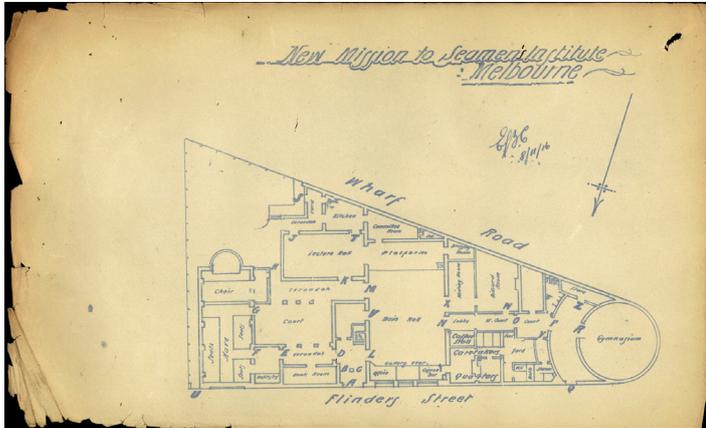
Plan of new buildings for the Mission to Seamen, 1916. PROV, VPRS 7882/P0001, 2071, Public Building Files, Seamen's Institute Australian Wharf Flinders Street Extension.
